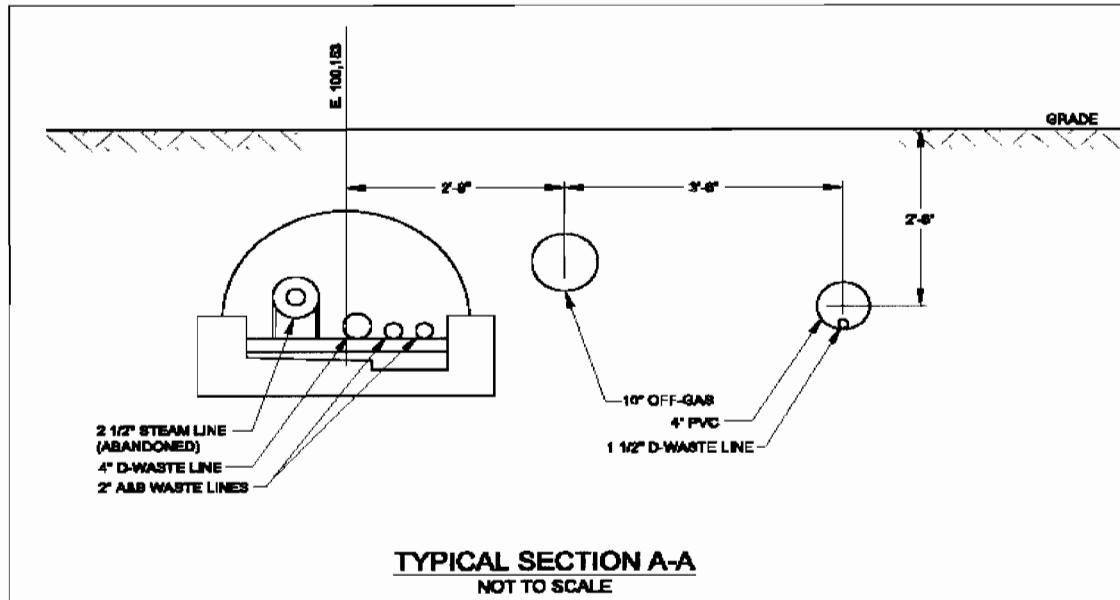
Typical Cross-Section of the Waste Transfer Lines
